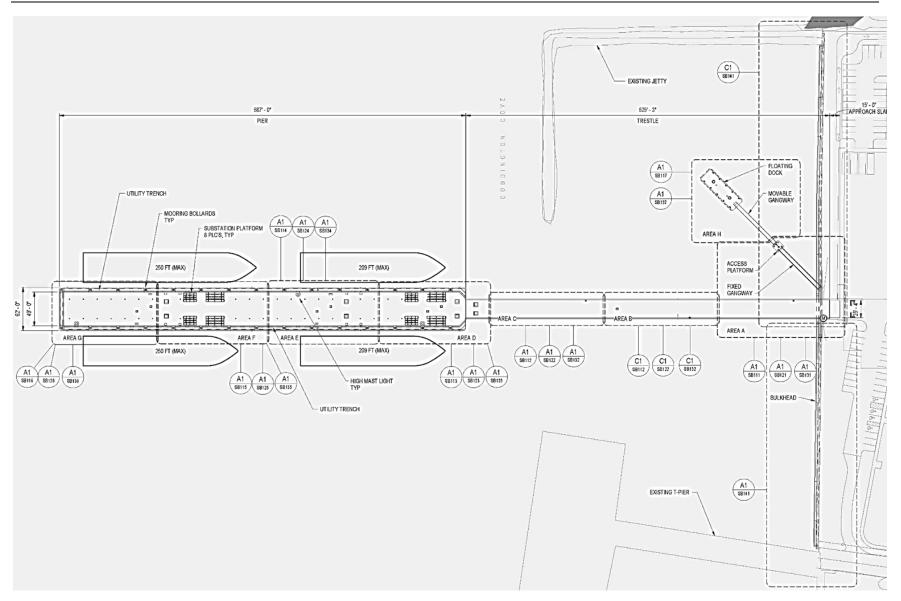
Plan View of Pier, Trestle, Floating Dock, and Bulkhead (Proposed Action)
